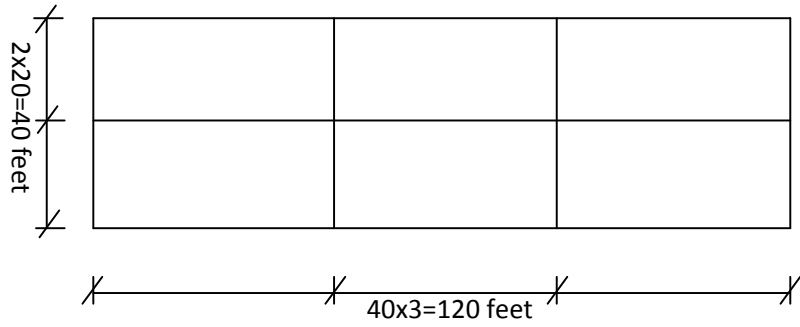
Floor Plan of 3-D Moment Frame Building
